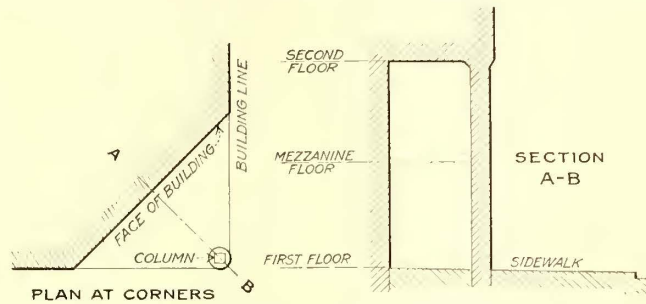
SUGGESTED PLAN OF INCREASING SIDEWALK AREA AT INTERSECTIONS OF SIDEWALKS
